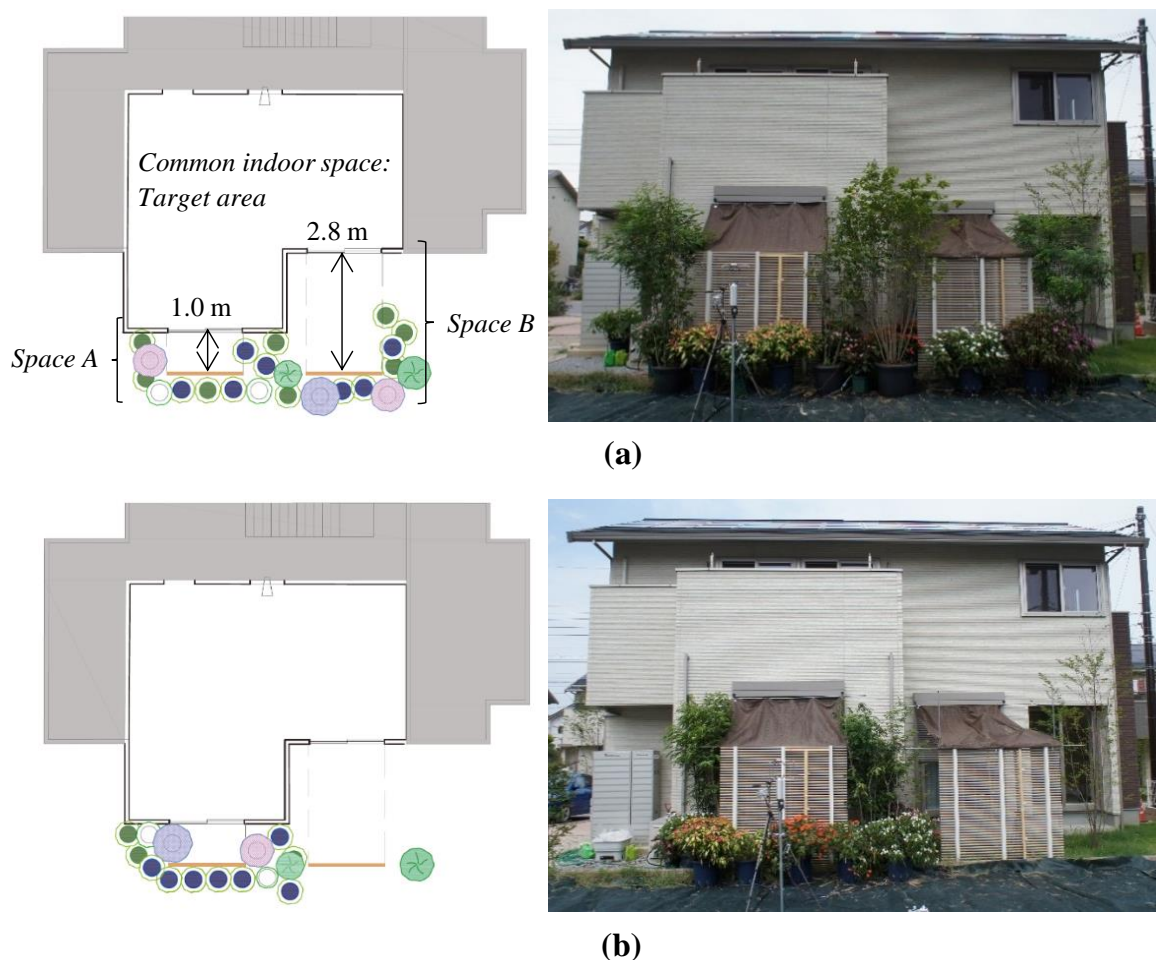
PCMs settings for (a) Day 1 and (b) Day 2. Left to right: Floor plan and view of southwest facade.
